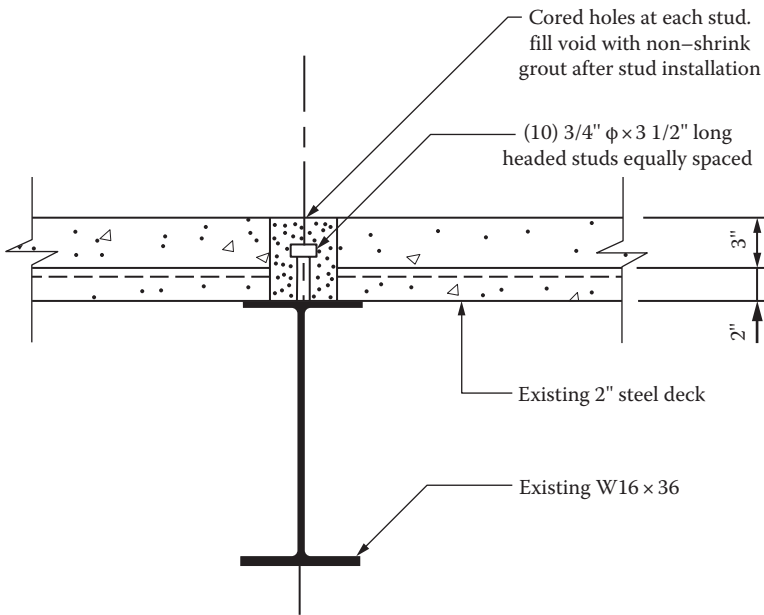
Beam reinforced by welding shear connectors for Example 3.3.
